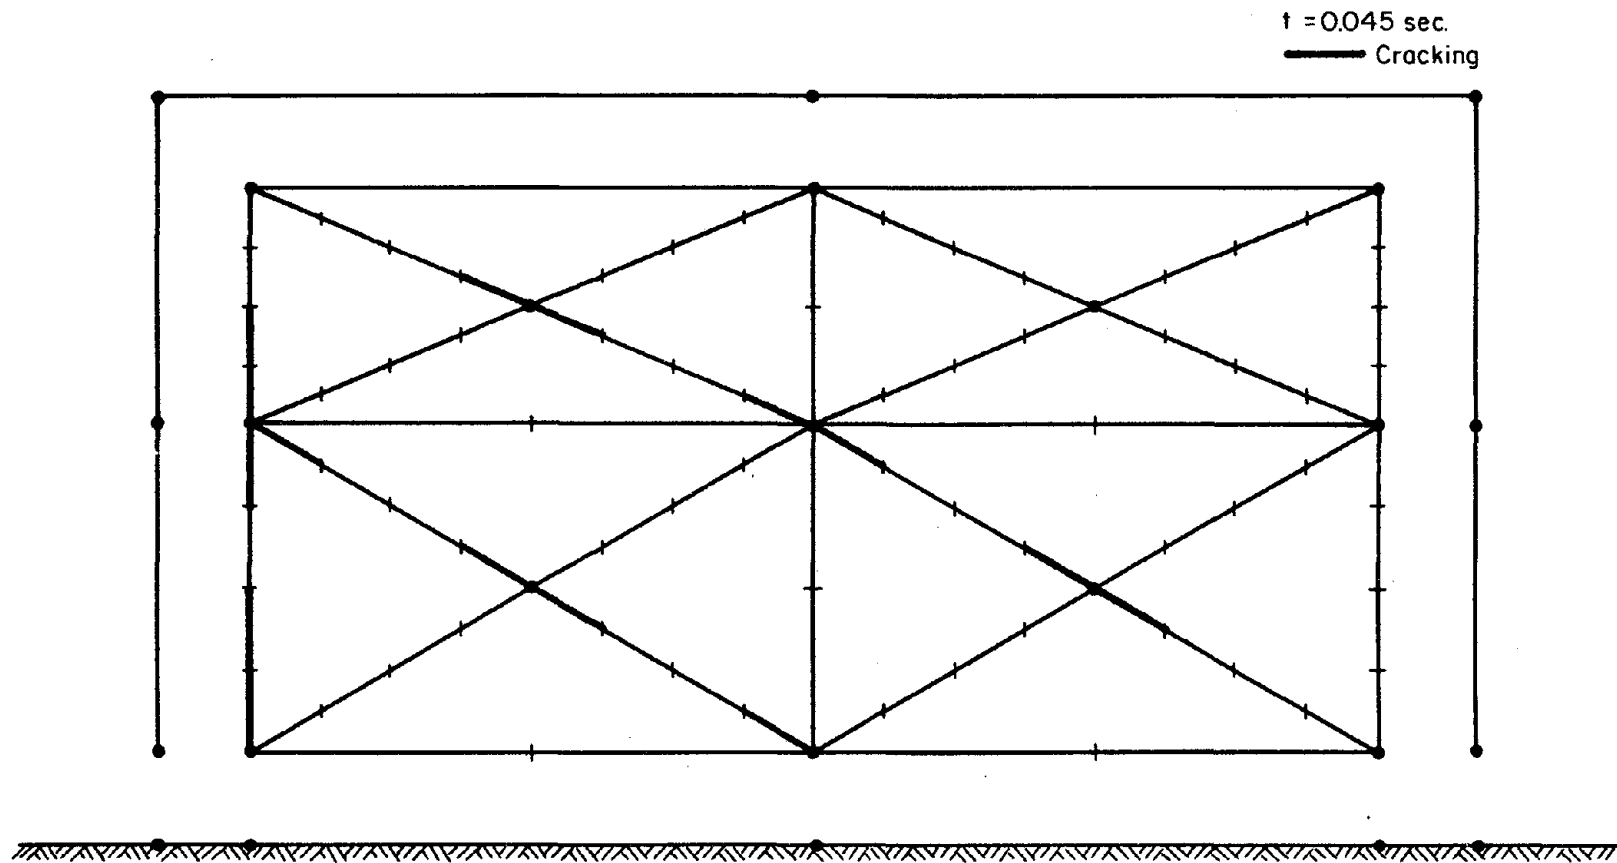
Crack Pattern: Frame Wall at $t=0.045$ sec
